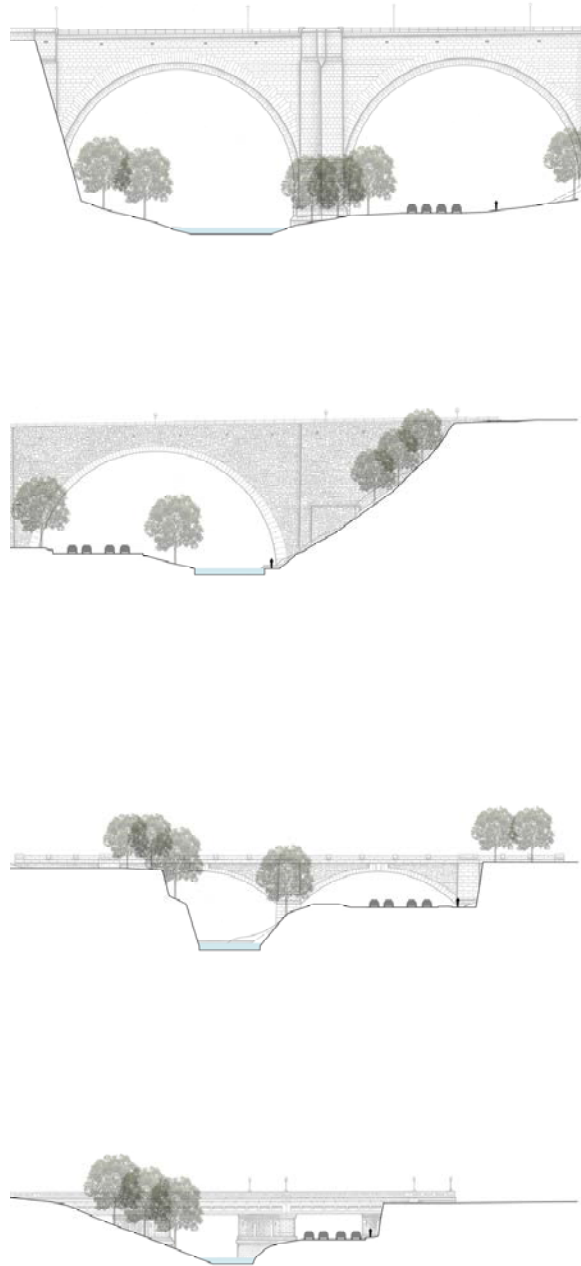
Sections along Rock Creek Park from Calvert Street NW to Georgetown
